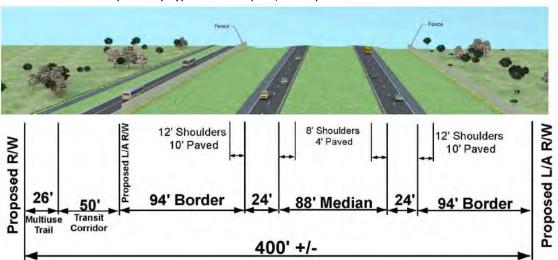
Eastern Expressway Typical Section (OCX, 2017b)
